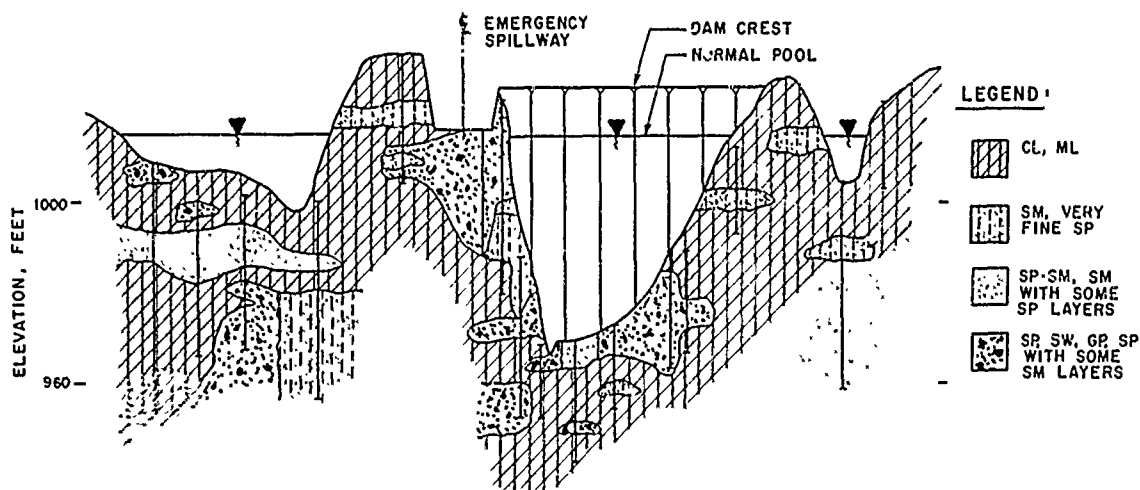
Subsurface Profile Beneath Dam (Section A-A', Figure 3)
